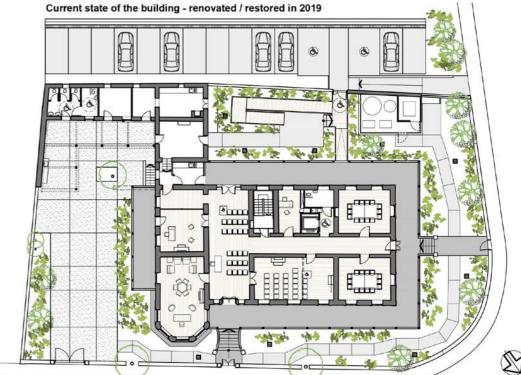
Plans and drawings of the building. © C. Marathovouniotis
